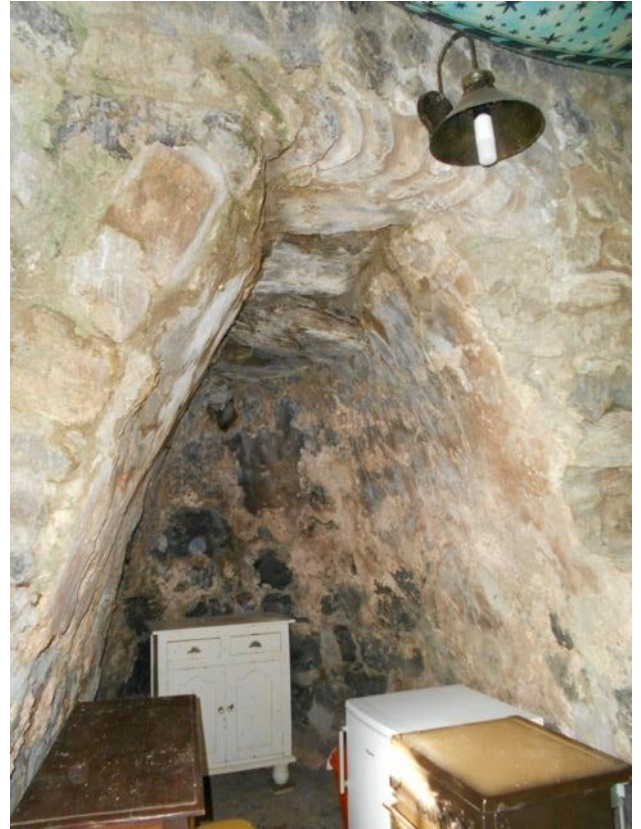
Interior of a vaulted roof. Here you can clearly see the vault and the construction going on inside (Photo by the author, 2024)
